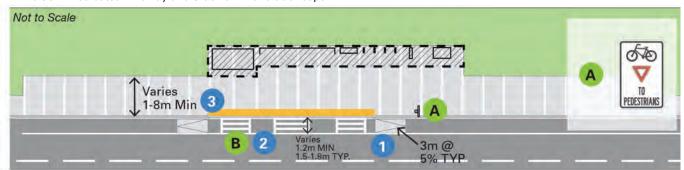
Dedicated Bikeway and Sidewalk Transit Concept
